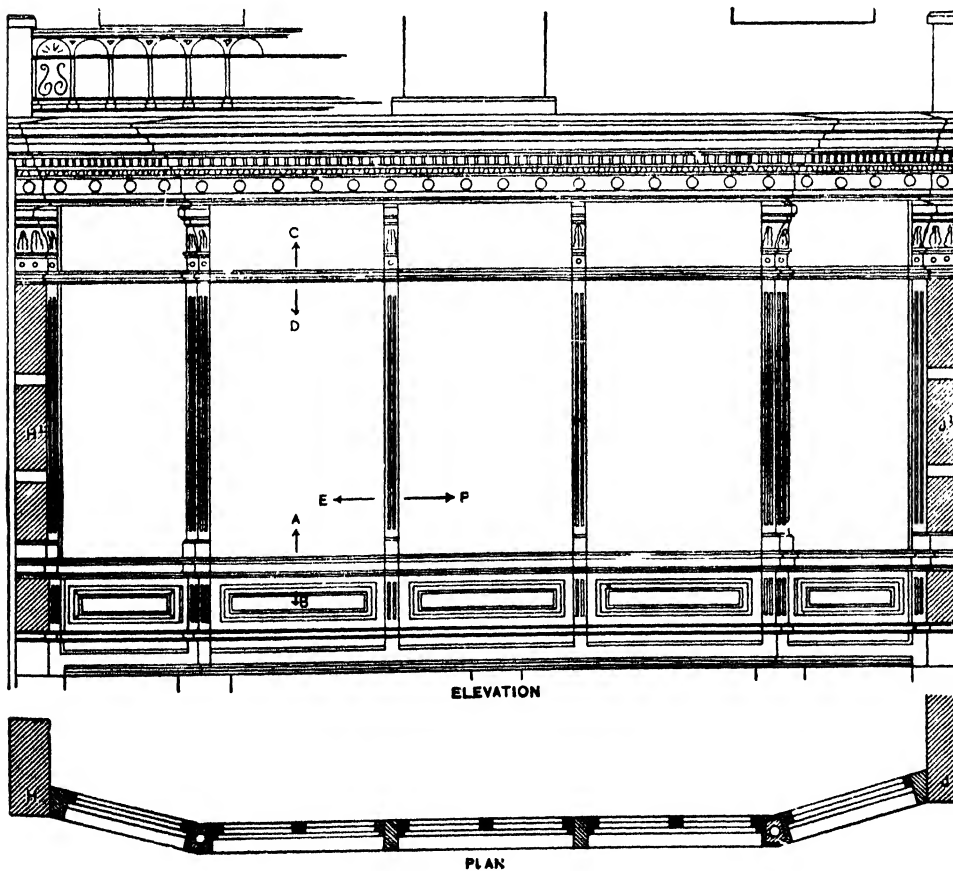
Elevation, Section and Plan of a Sheet Metal Conservatory Front
